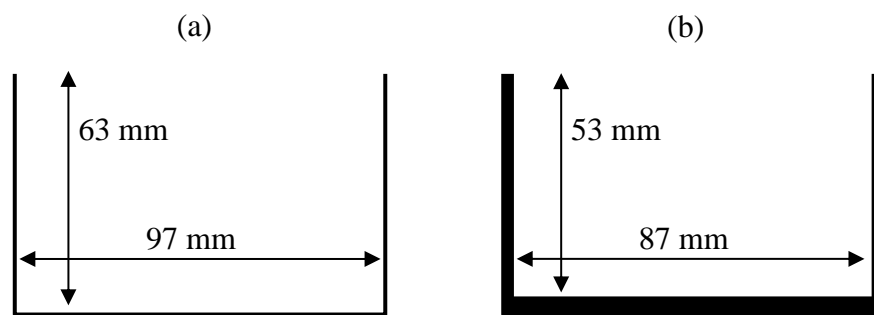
Cross-section of gutter showing dimensions: (a) without corrosion; and (b) with corrosion
